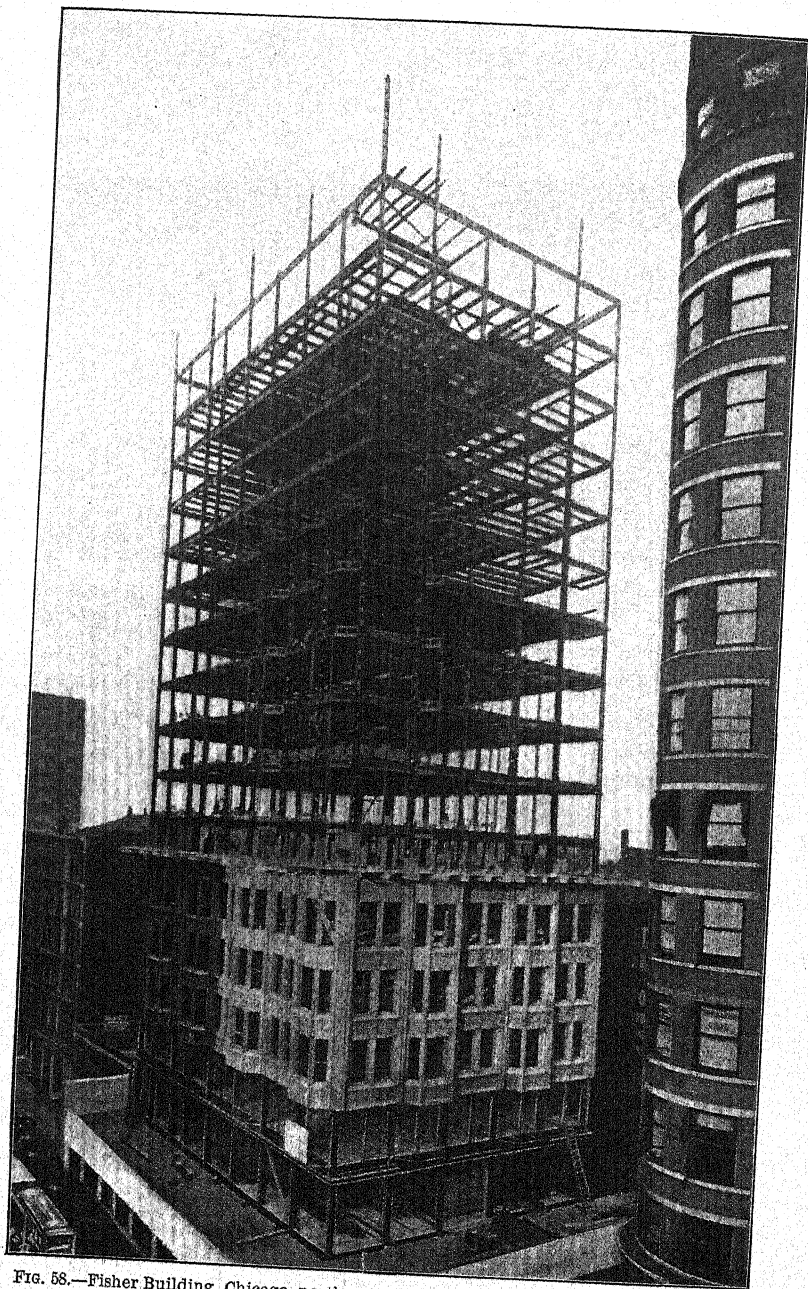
Fisher Building, Chicago, northeast corner of Van Buren and Dearborn streets.
